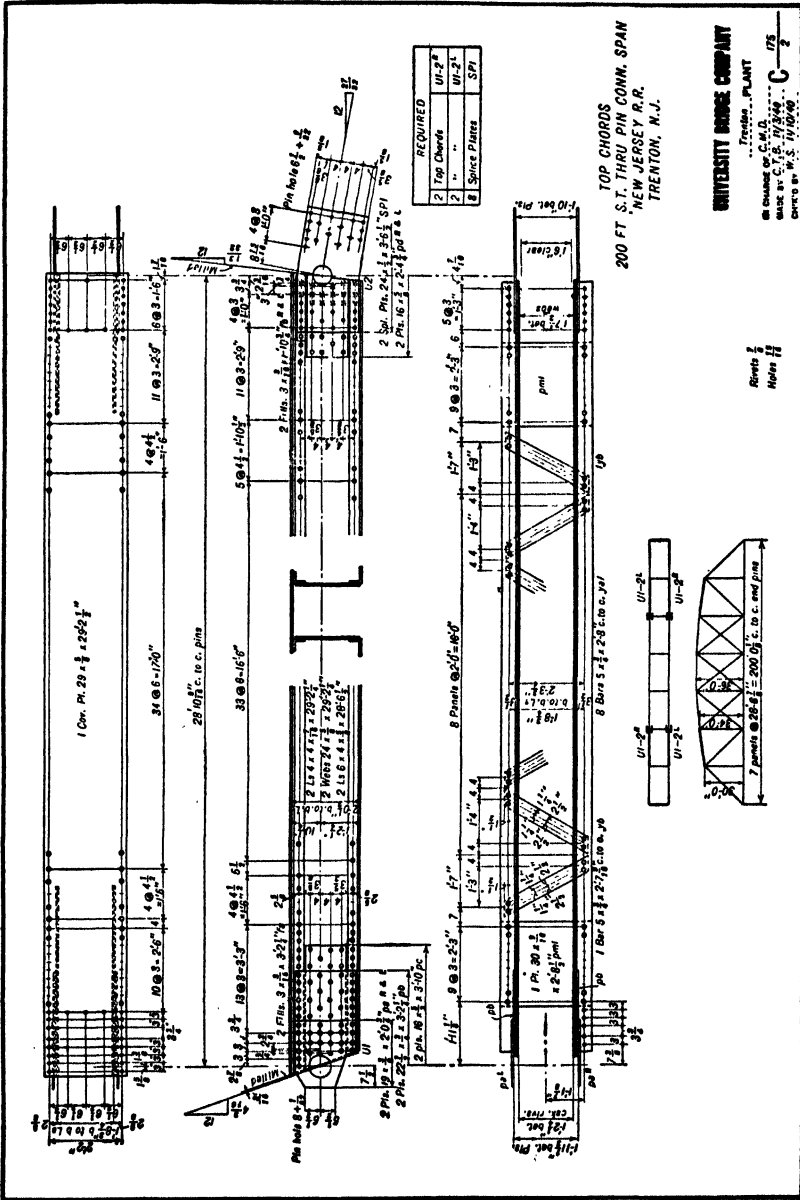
Top-Chord Member for a Pin-Connected Truss of a Railroad Bridge.
